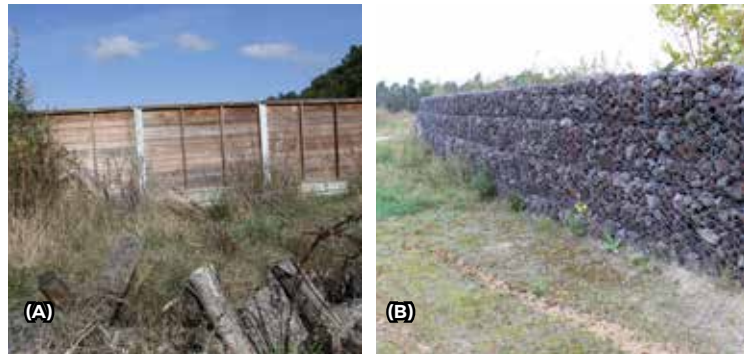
Protection walls effectively reduce disturbances on green bridges. They can be made of wood (A), plastic, or in the form of stone walls (B). Stone walls have disadvantages in higher costs and greater load on the bridge, but also advantages in unlimited lifespan and creating new habitats (for example for reptiles). © Václav Hlaváč
